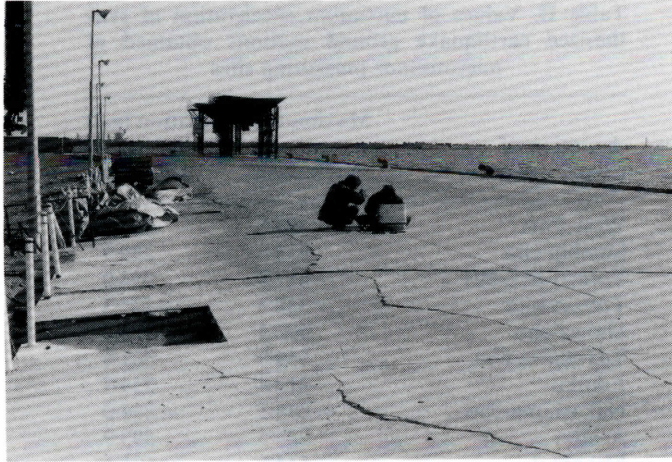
West Port of Kushiro. Back fill materials behind the quay wall liquified at West Port of Kushiro, which led to the wide-spread cracks on a concrete pavement
